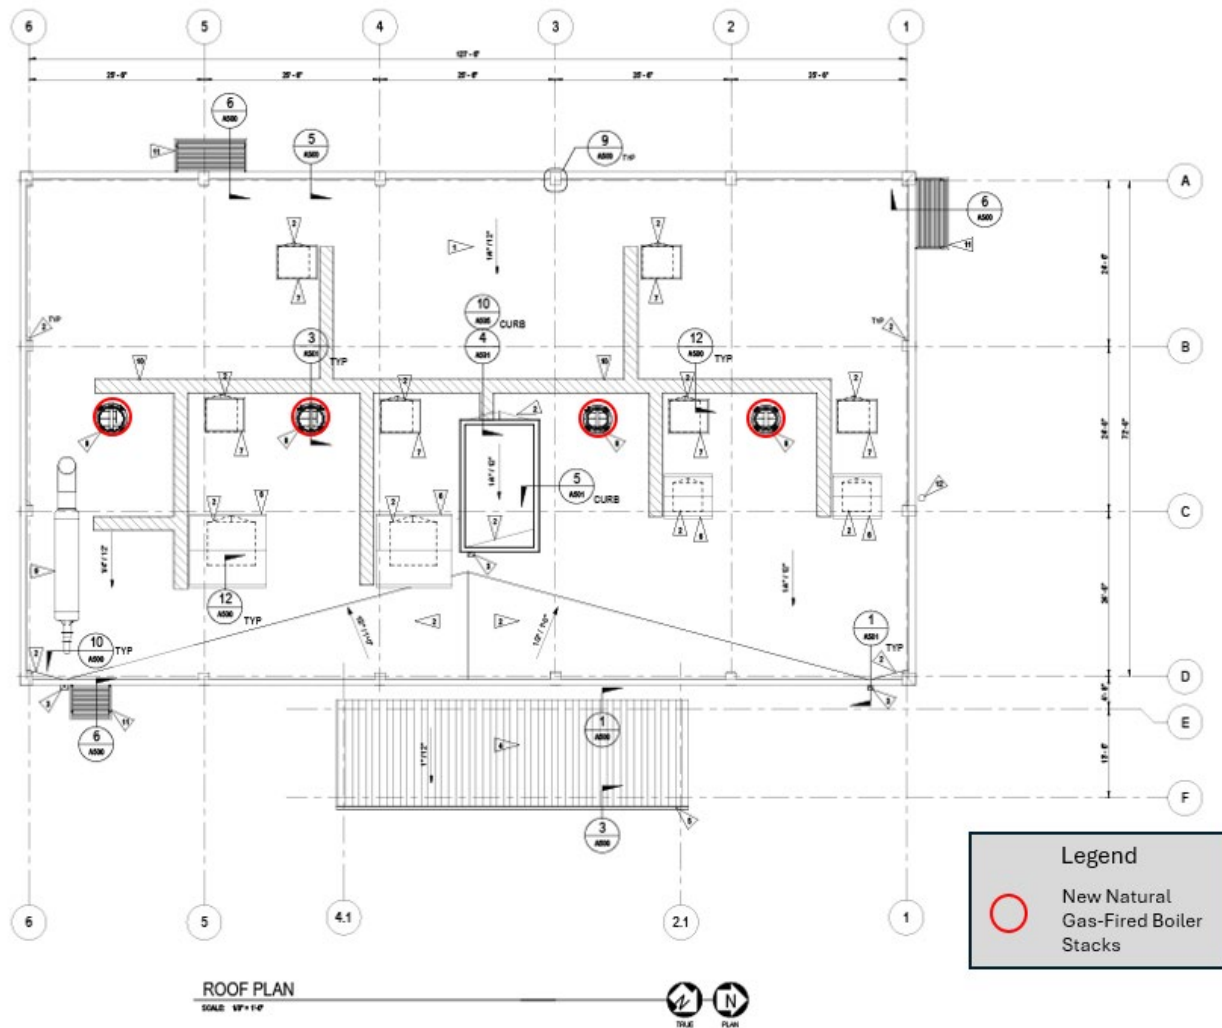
shows the site plan of the boilers to be located in Building 3-150.
